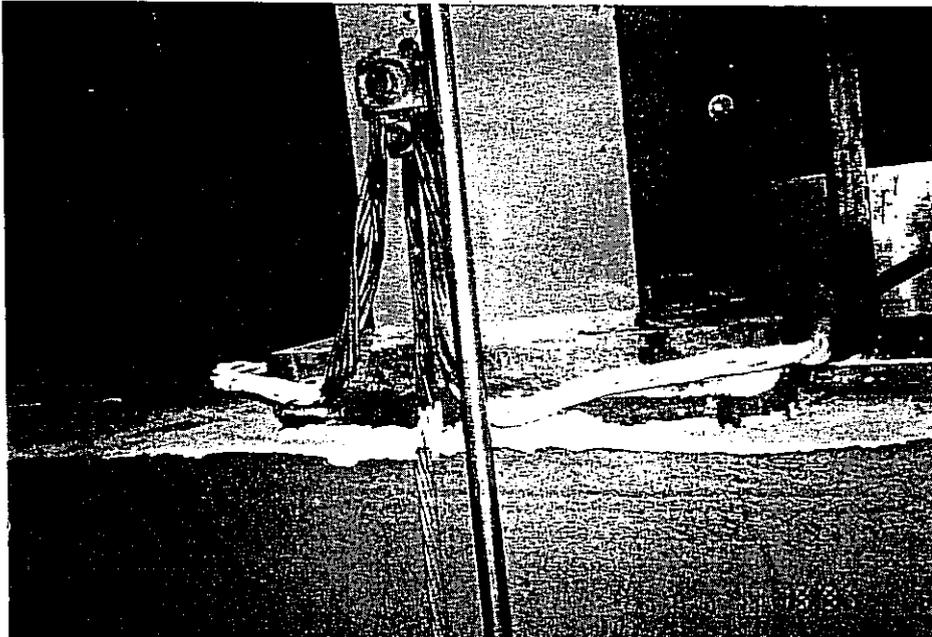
Typical column base anchorage to grade beam as seen on the ground floor mechanical room. Notice the connection and bolt installation are not designed as a moment connection.
